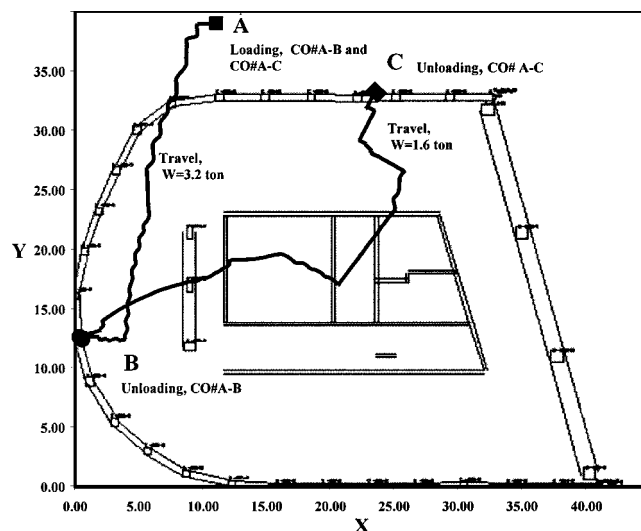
Horizontal location measured for perimeter column and beam—concrete placement
